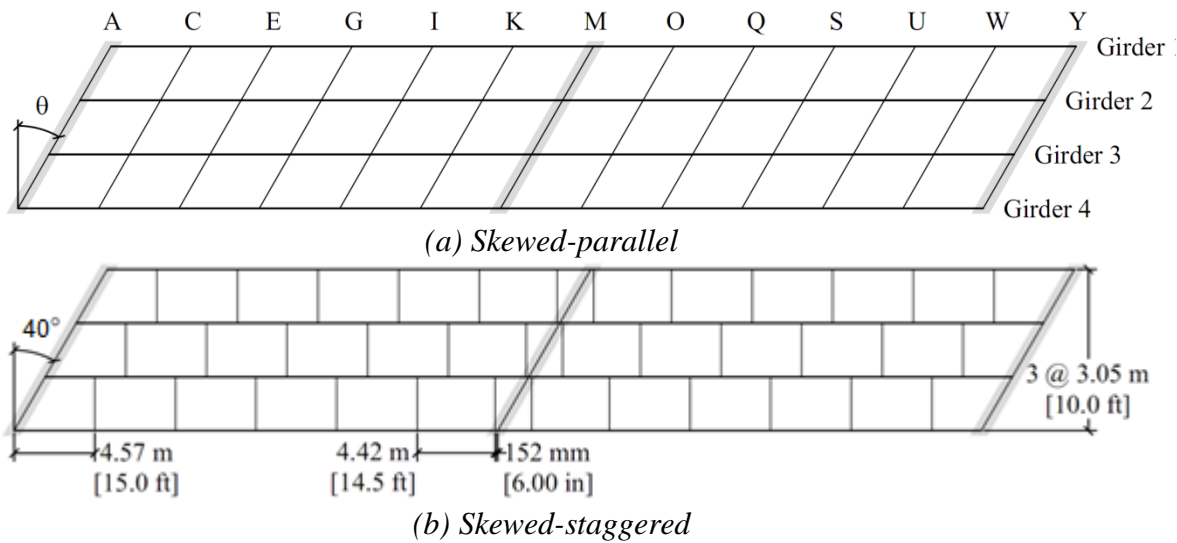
Bridge configurations (40° skew with 4.6 m [15.0 ft] cross-frame spacing)
